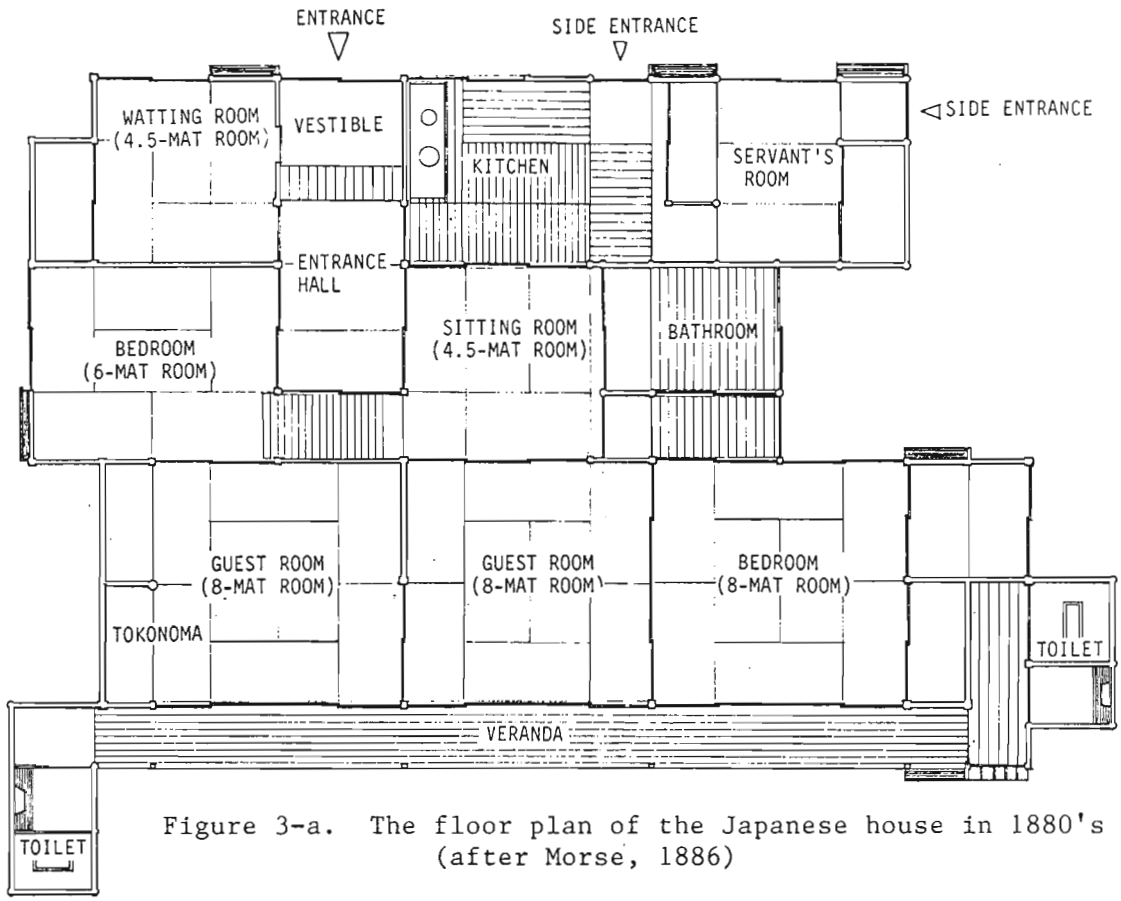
a. The floor plan of the Japanese house in 1880's (after Morse, 1886)
